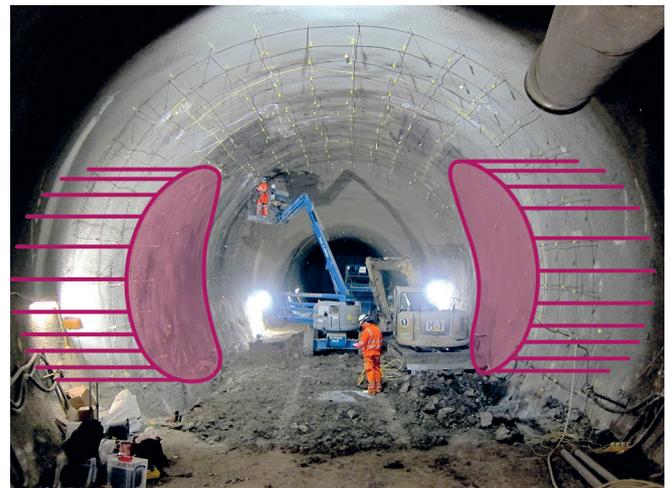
INSTRUMENTATION OF CROSSRAIL LIVERPOOL STREET STATION CONCOURSE TUNNEL, SHOWING FIBRE OPTIC SENSORS BEING INSTALLED IN THE THICKENED LINING, WITH THE LOCATION OF THE FUTURE CROSS-PASSAGE EXCAVATIONS SUPERIMPOSED
